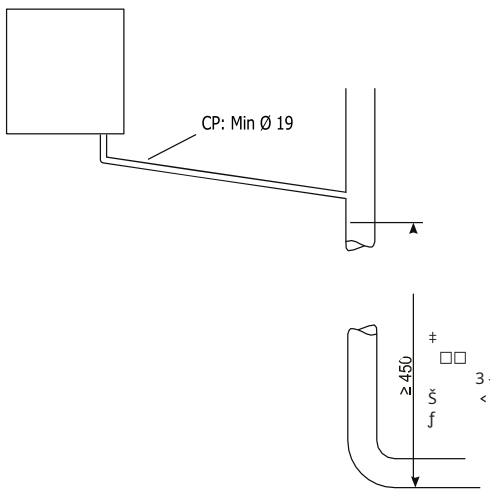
Connection of the condensation water drain pipe to the internal drainage and ventilation pipe
